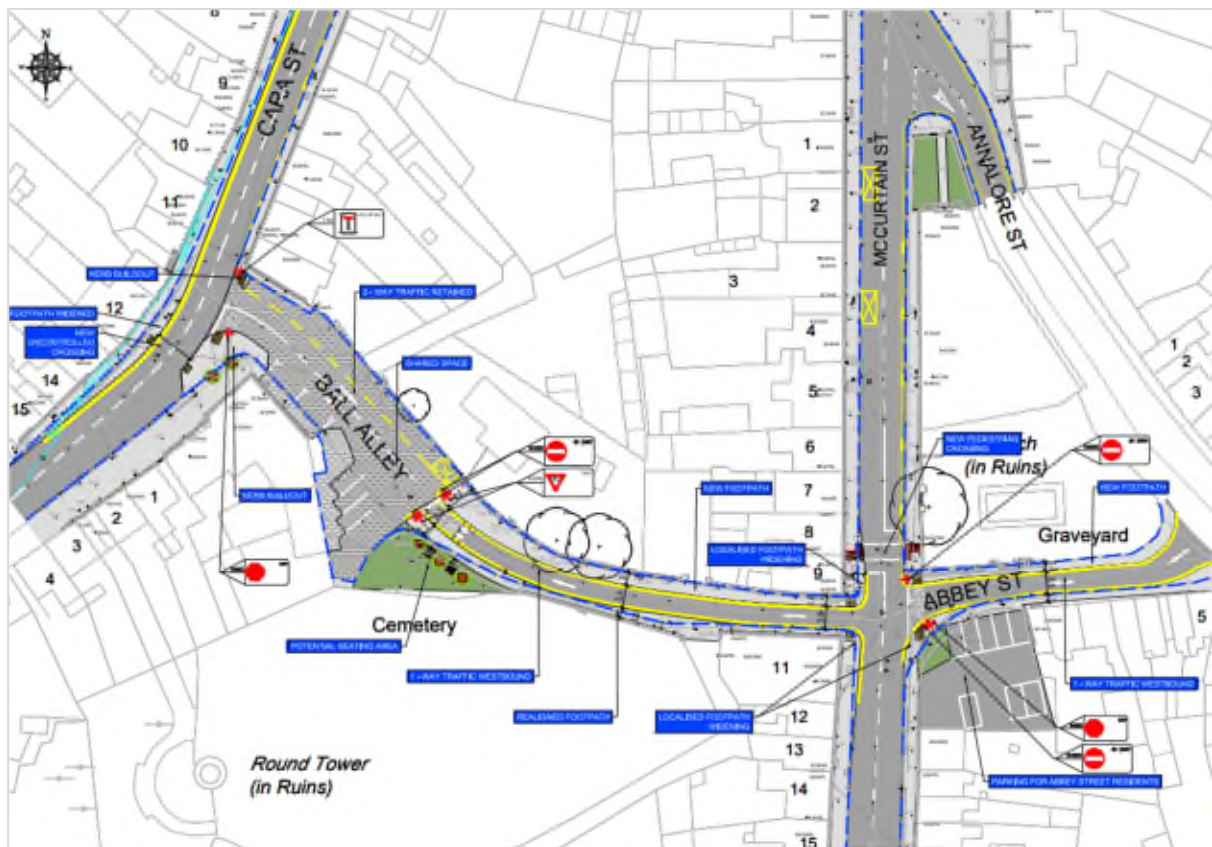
Preliminary Design Layout for Ball Alley and Abbey Street Scheme
